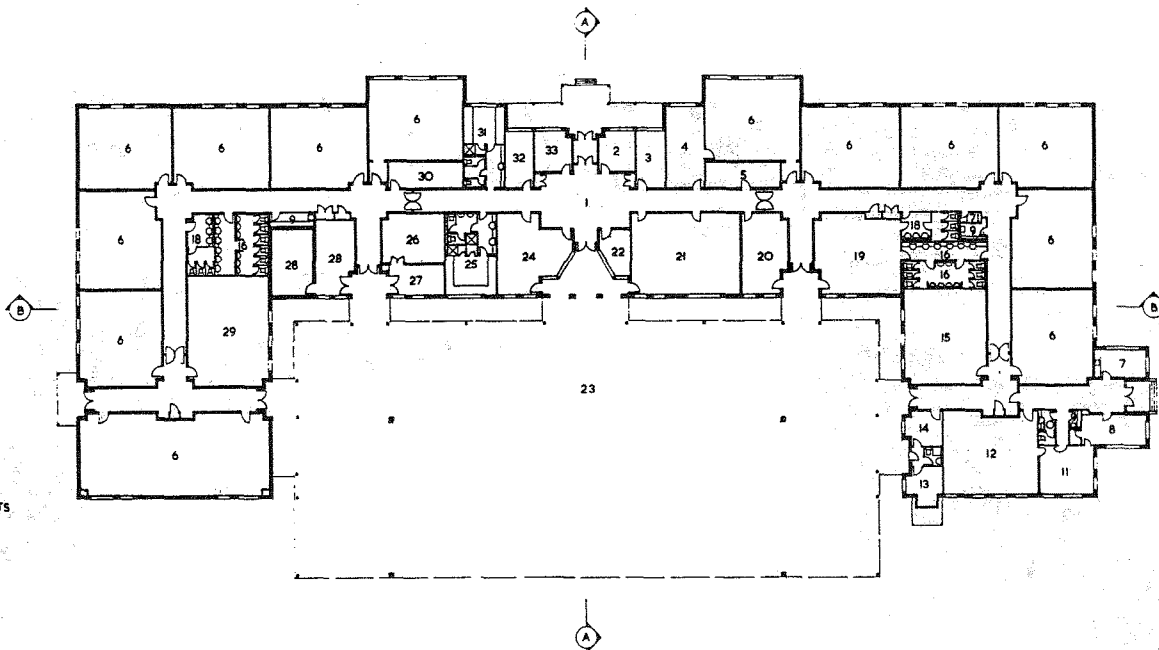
RECRUIT SCHOOL - ADMINISTRATIVE/INSTRUCTIONAL BUILDING - FLOOR PLAN
